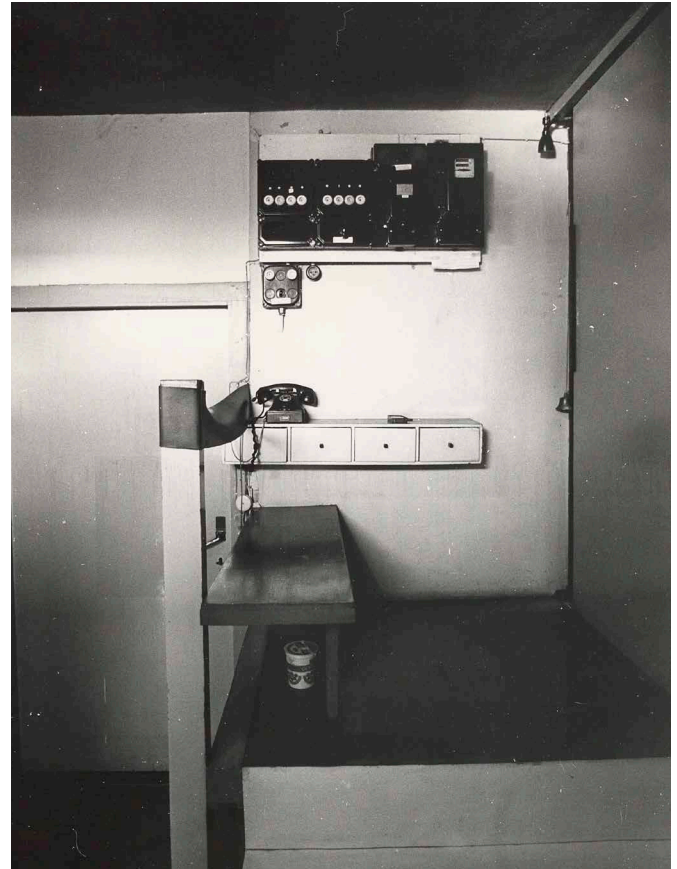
Ground floor, hall with fuse box and platform, undated
